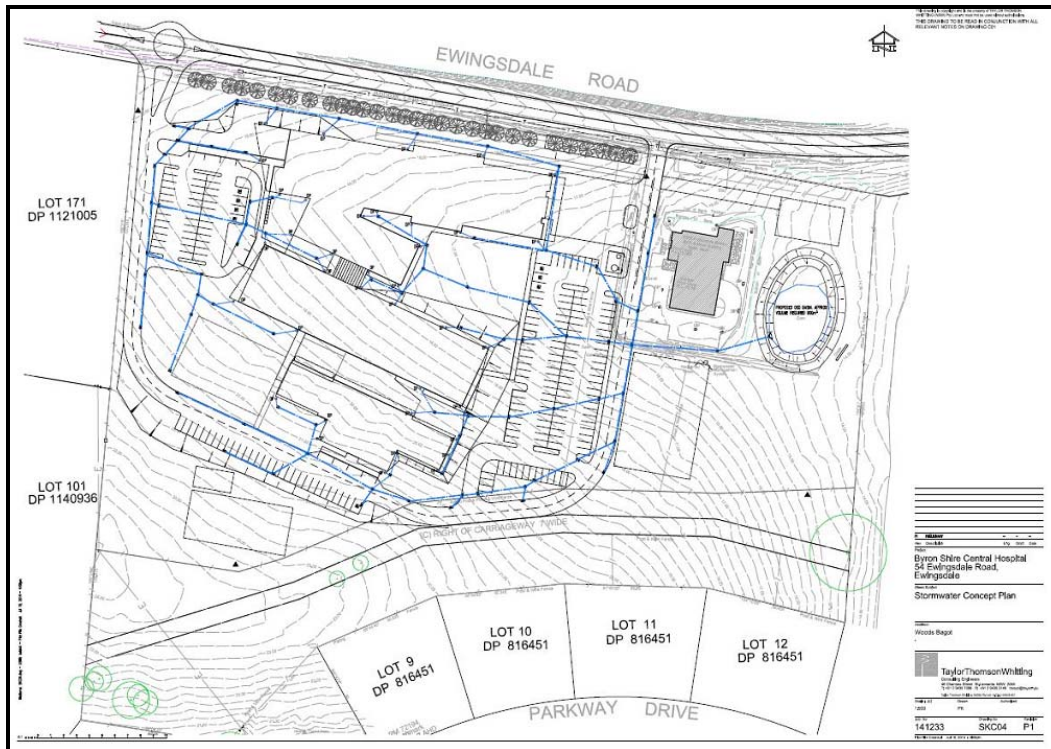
Stormwater Concept Plan (Source: Taylor Thompson Whitting)
